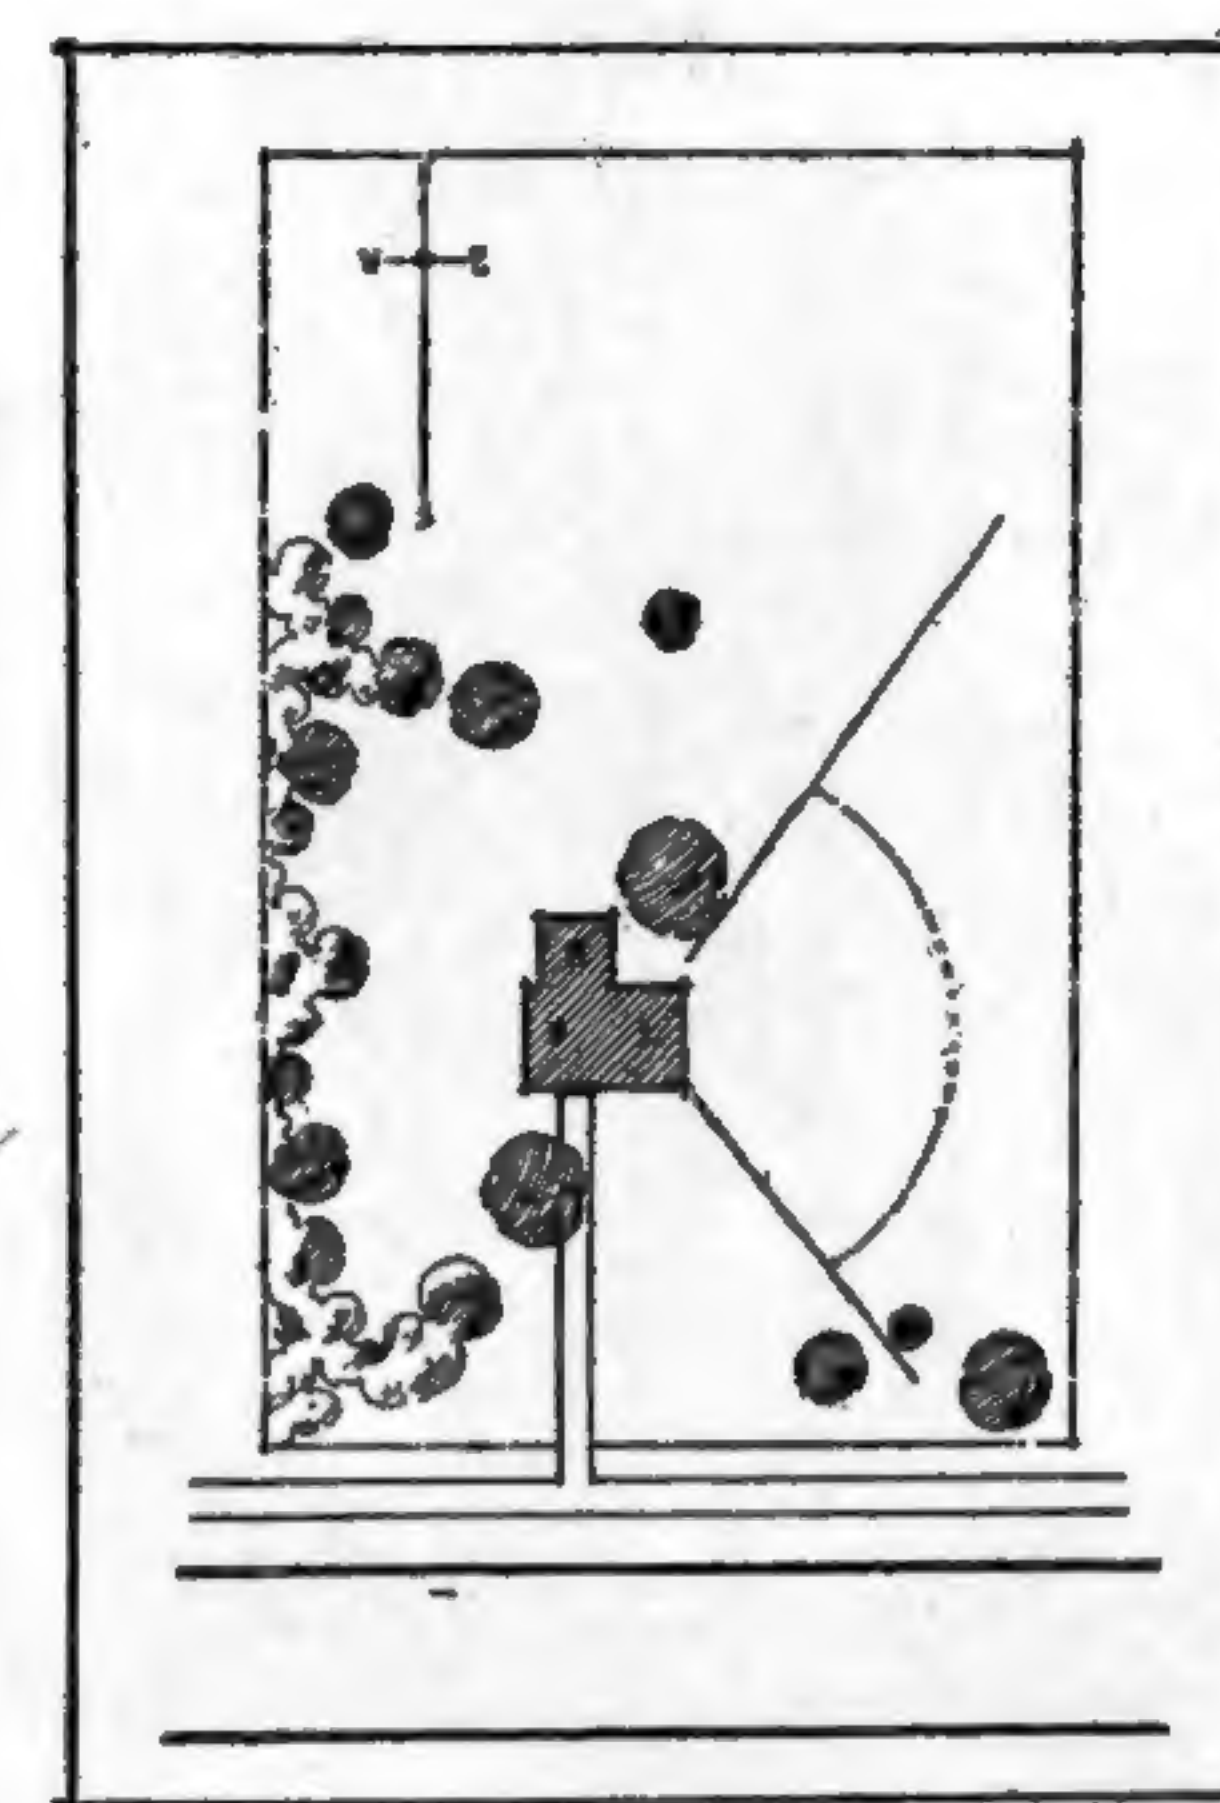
FIG. B — Planting plan to insure best effect of shade, outlook, protection, and privacy on a lot facing south
